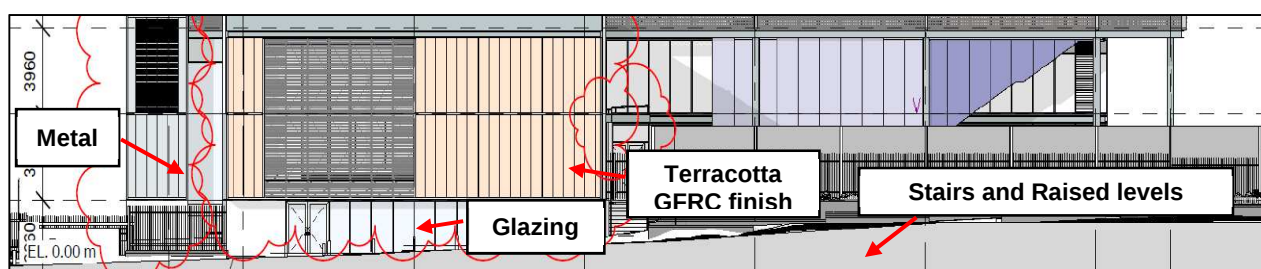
Proposed Barrack Lane elevation for the sports/movement complex (Source: Applicant's Modification 3 EIS)
